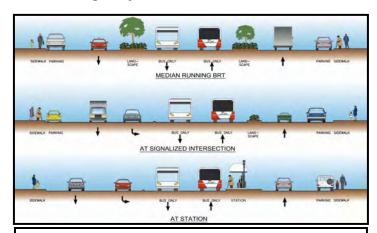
Roadway Cross Section with BRT-only Lanes
